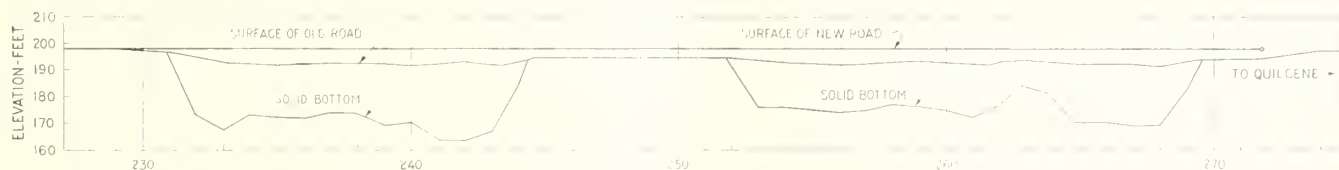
PROFILES OF THE OLD ROAD, THE NEW ROAD, AND SOLID SWAMP BOTTOM.
